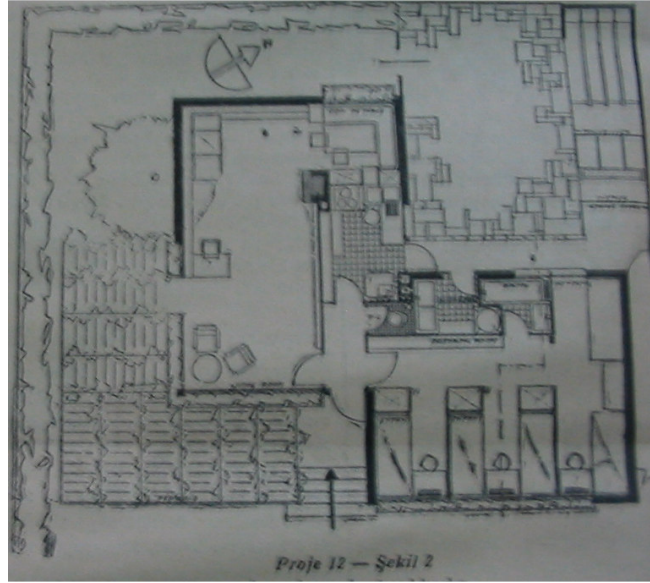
, Plan of a modern house, Ulus: 12 Sonkanun 1935
